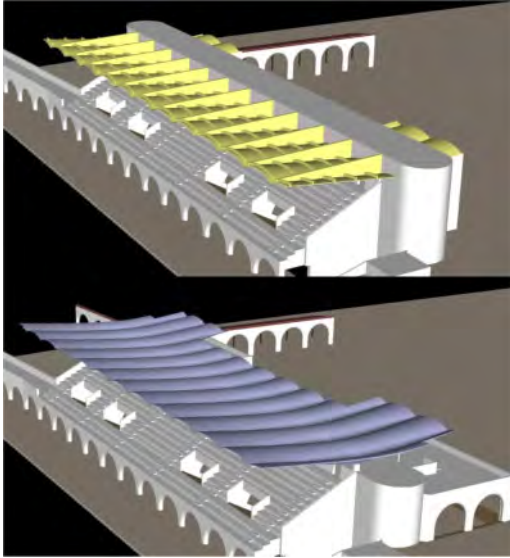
Roof of the Zarzuela racecourse stands proposed in the competition (above), the cantilever beams between which the sections of cylindrical shells with stiffeners placed at the top can be observed. Built cover (below) in which a continuous shell has replaced the original cylindrical one (Image: the author and Fernando Asanza).
